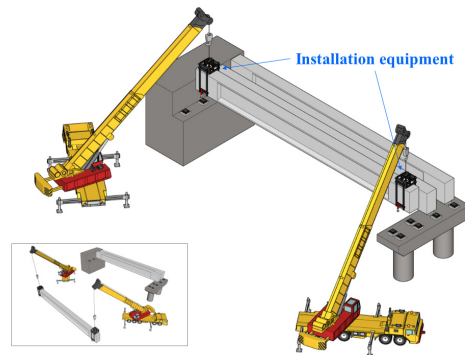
Conceptual illustration: bridge girder installation with the remote precision installation equipment [13]
